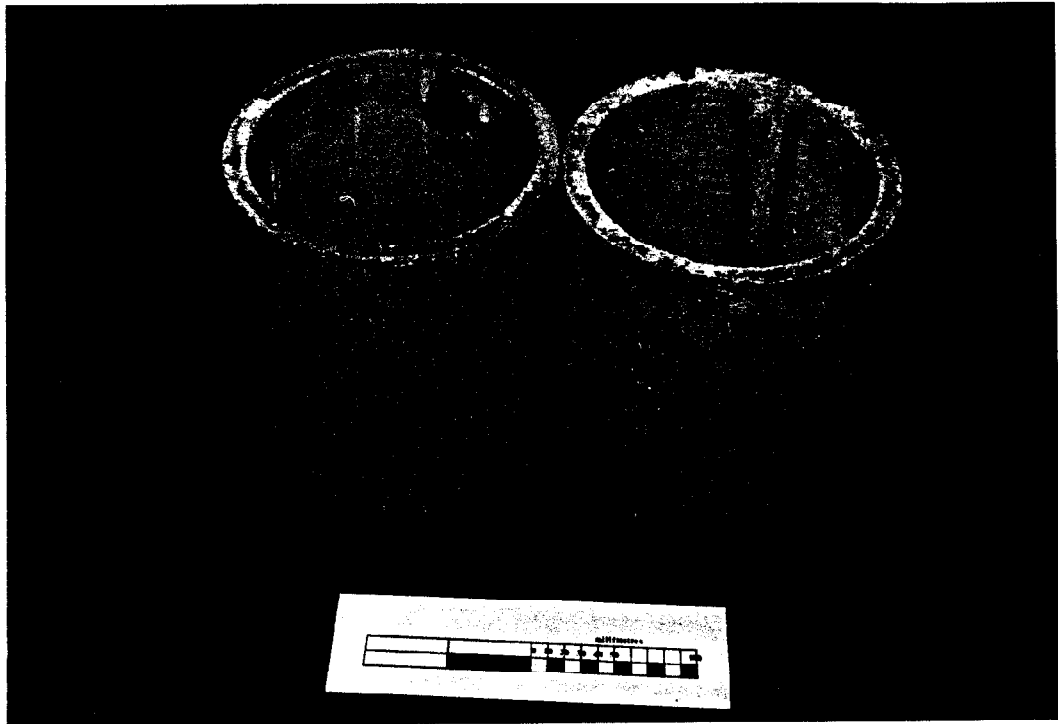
Spalling at common plain end of pipes (Test 14).
